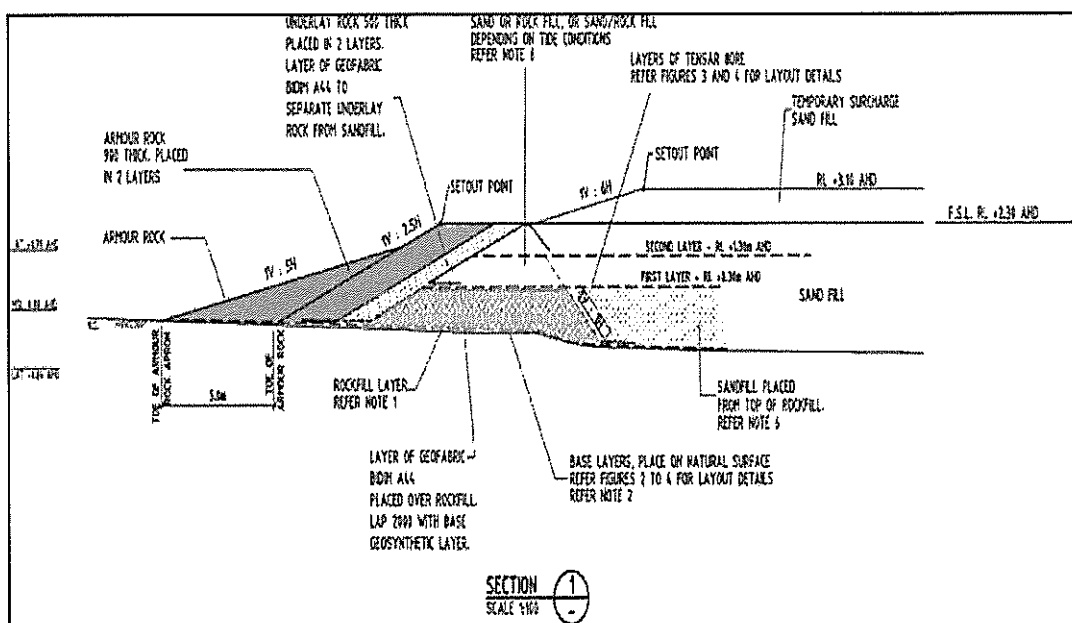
Typical section of revetment and geosynthetic reinforced fill – note that this section was taken from design drawings and its reference to figures and notes do not apply to this paper.
